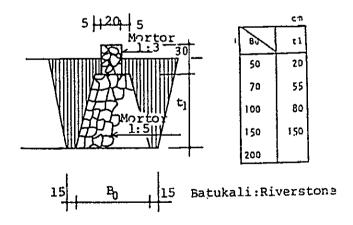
BATUKALI-CONTINUOUS FOUNDATION DETAIL
